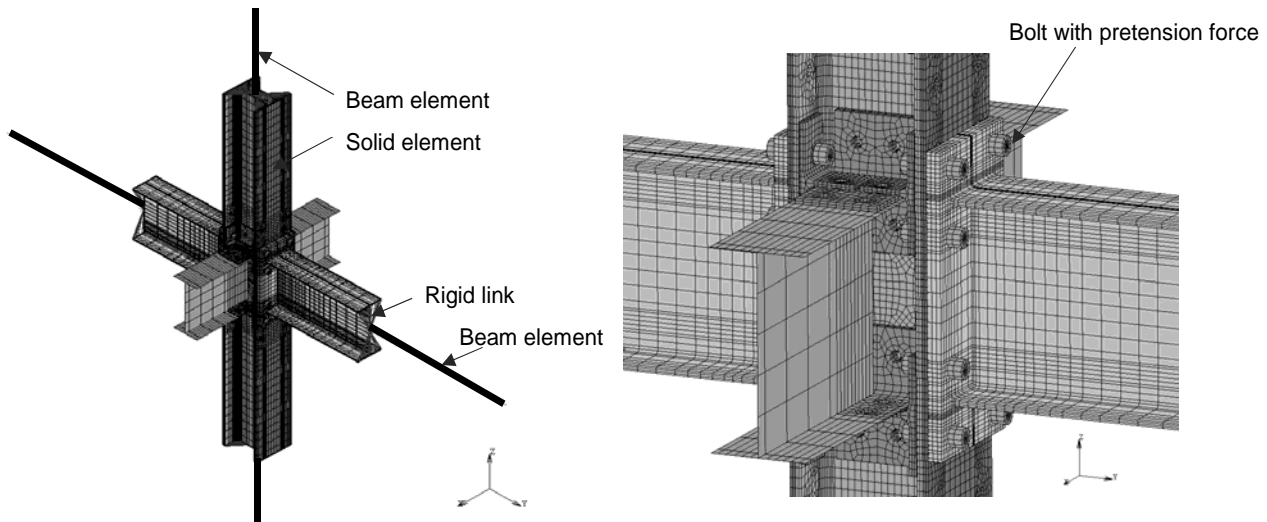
Finite element model (HTS): (a) entire model; (b) details around the beam-to-column connection.
